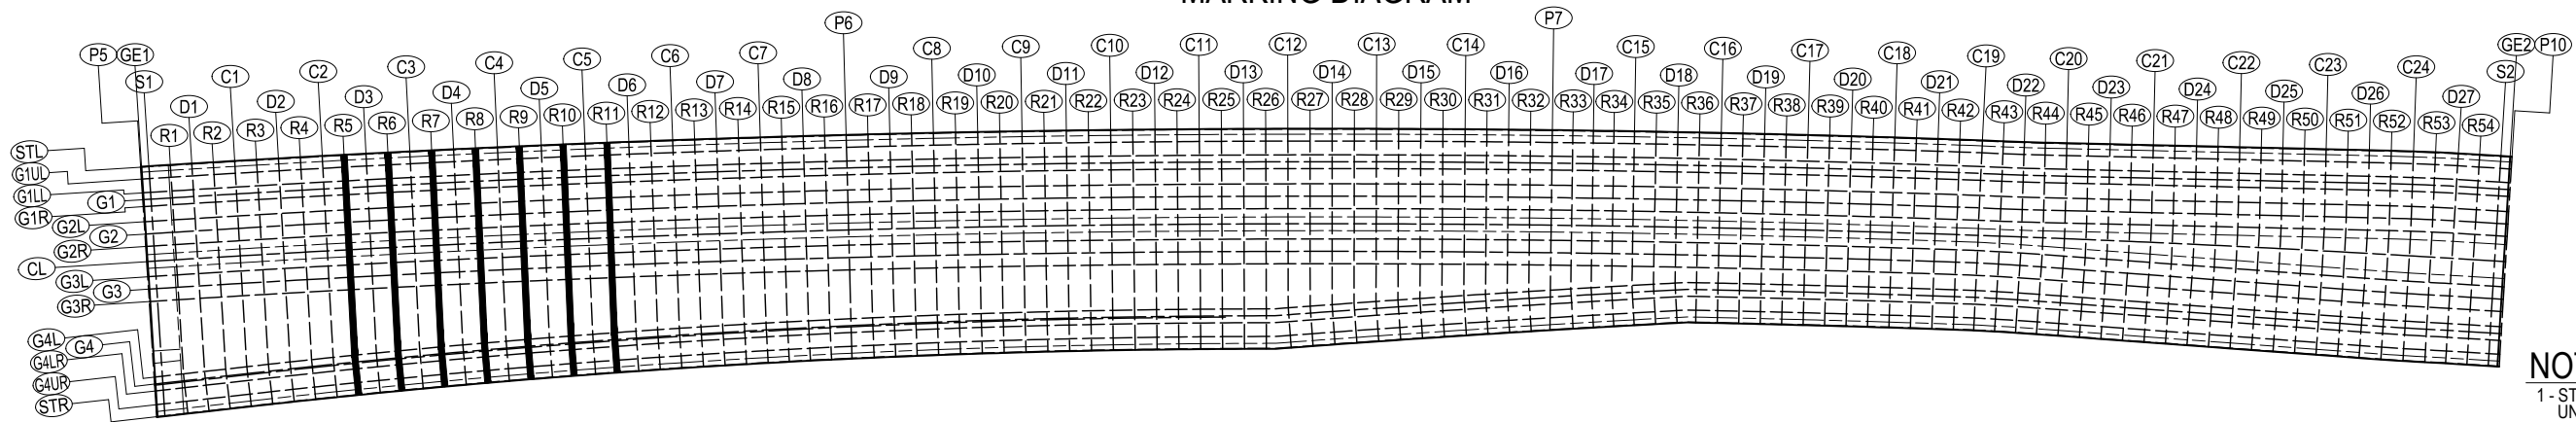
DETAIL OF CROSS BEAM SECTION (3) S=1:60 R5 TO R11 (1)
